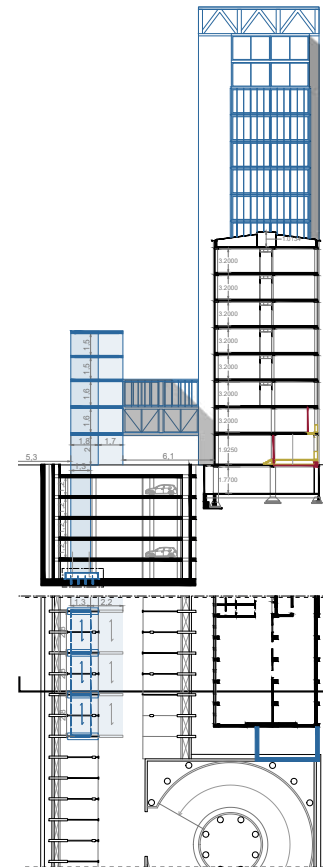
Projection of additional foundation on existing carpark plan 1:1000
